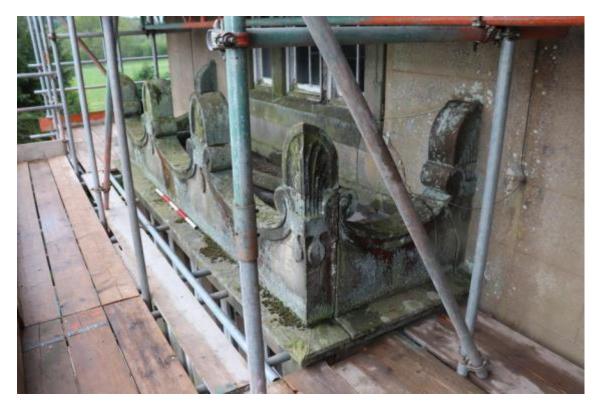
Phase 3 stone parapet detailing above the projected bay window, looking south, scale 1m
